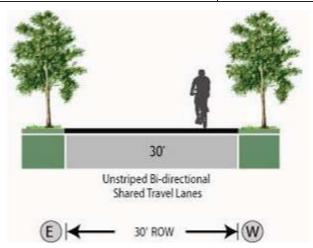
Conceptual Section 2.4a1 Bicycle Boulevard Improvements on Riverwood
